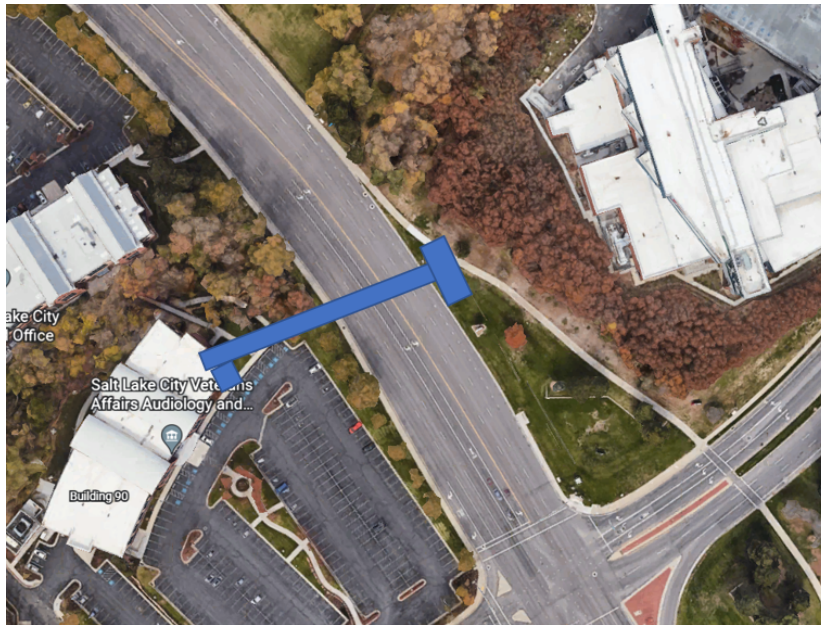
Plan View of Overpass Connection to VA Structure: A ramp and stairs are shown on the east side while the west side depicts a direct connection to the VA building, with indoor elevator/stairs for 24/7 access [11].
